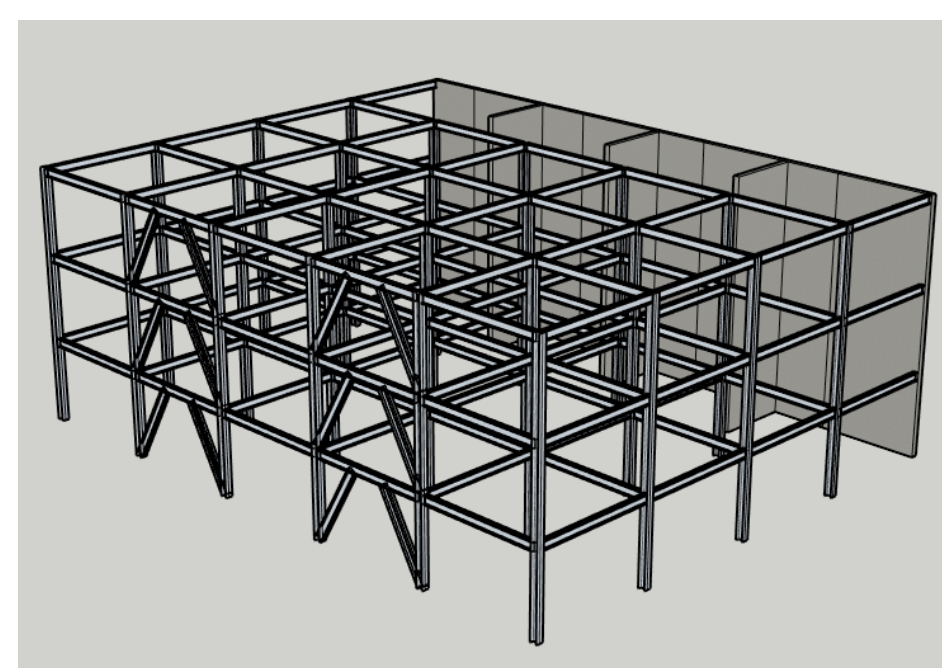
Type B - Concrete walls and steel frames acting as a dual system
